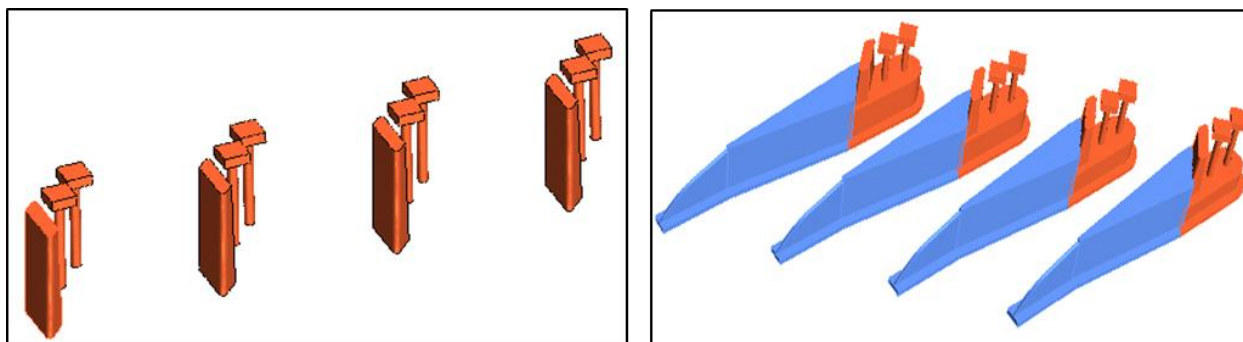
Existing piers (left) and existing piers with enclosures and extensions (right)
